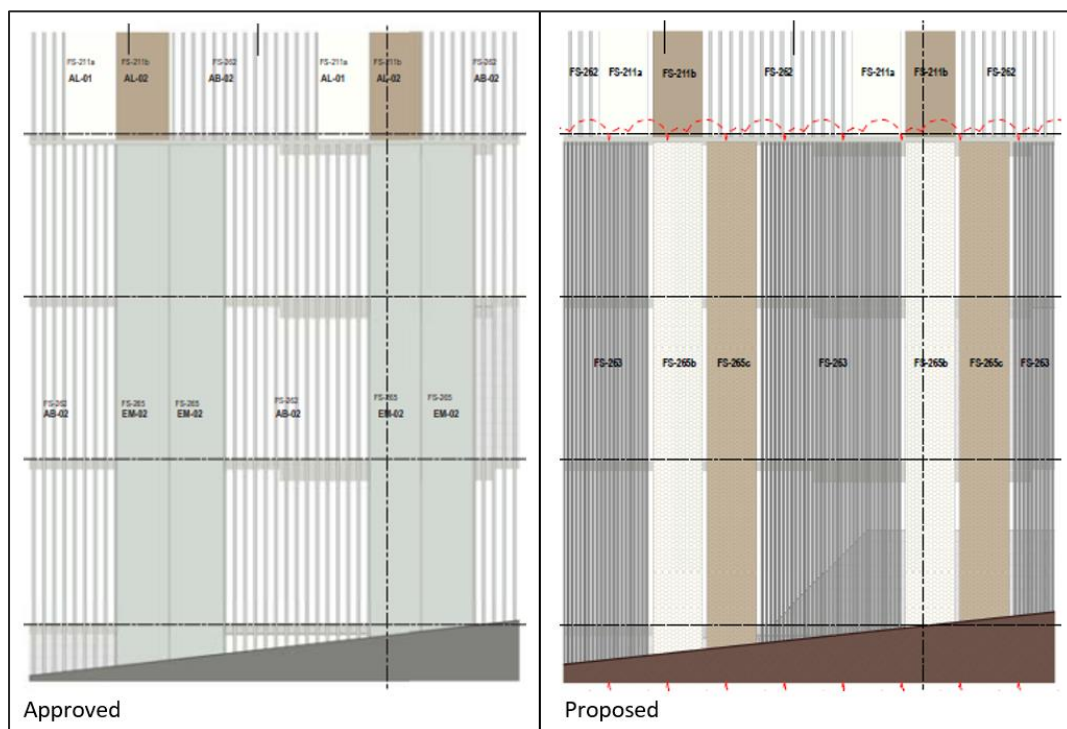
| Approved and proposed south elevation façade details (Source: Modification Report)
